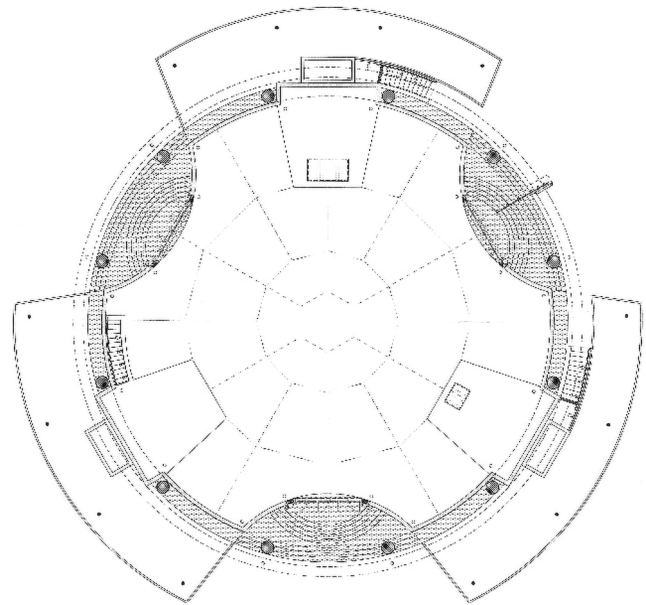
The French Pavilion, ground-floor plan (contract design, 2010.)
